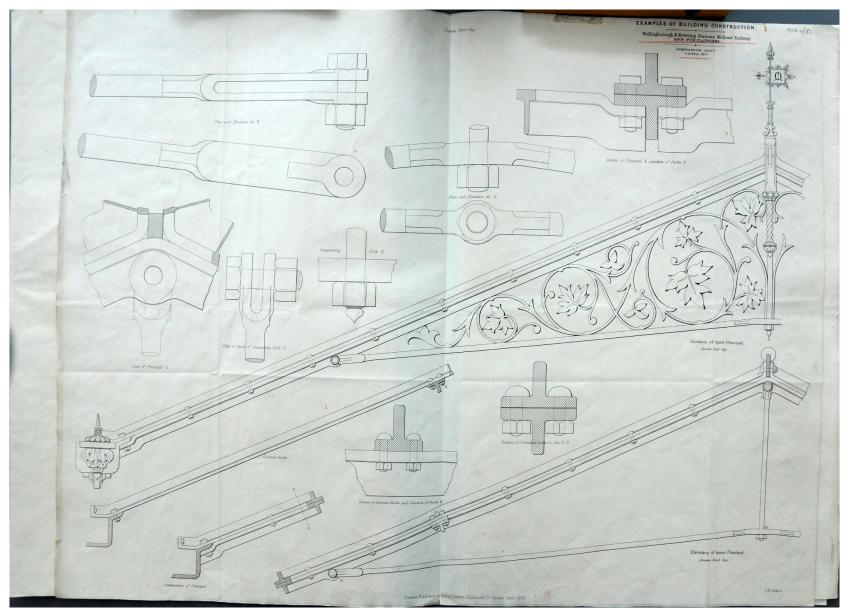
Detailed drawings of the 1857 canopy signed by Driver and reproduced in Henry Laxton's *Examples of Building Construction* in 1858. The surviving 1879 canopies at Kettering were based on this earlier design.
